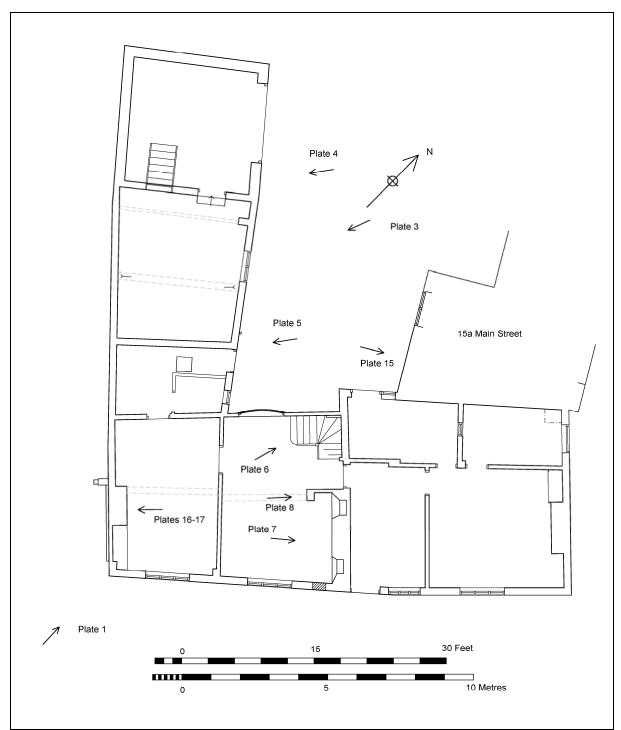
Location of Plates 1-8 and 15-17 on ground floor plan.
